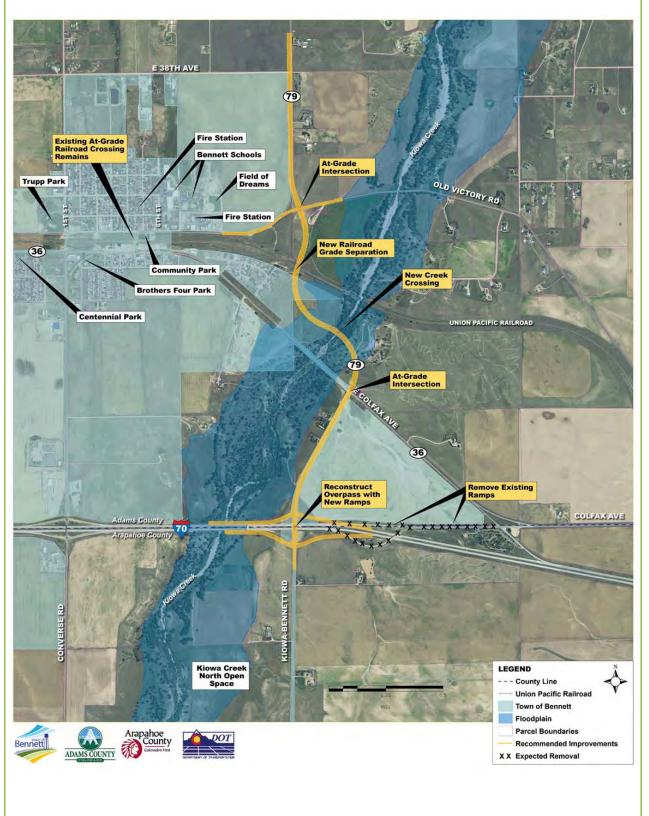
Alternative 6 - East SH 79 with Kiowa-Bennett Railroad Crossing
